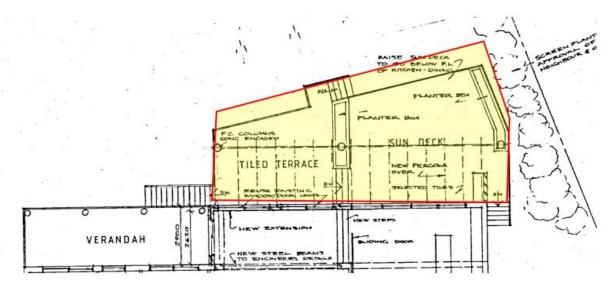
Approved ground floor terrace and balcony (highlighted in yellow) (Source: GIPA from NBC)
